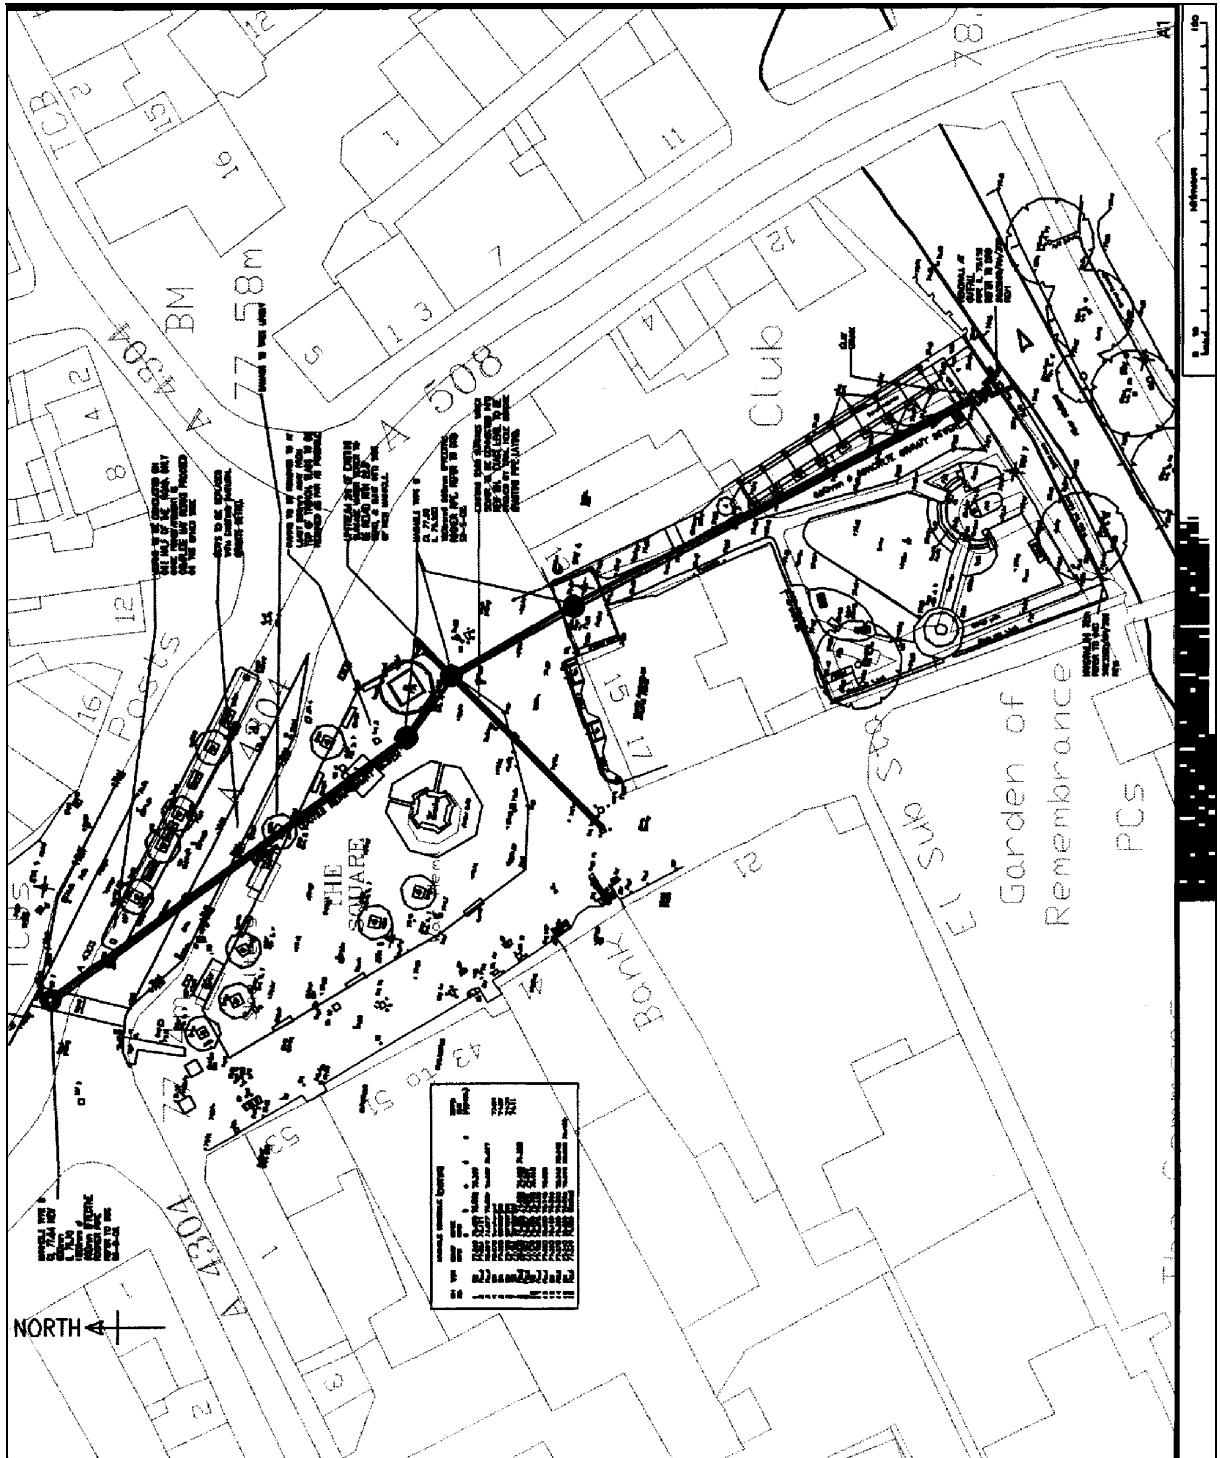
Detail plan of the trench leading southwards from the High Street (not to scale)
